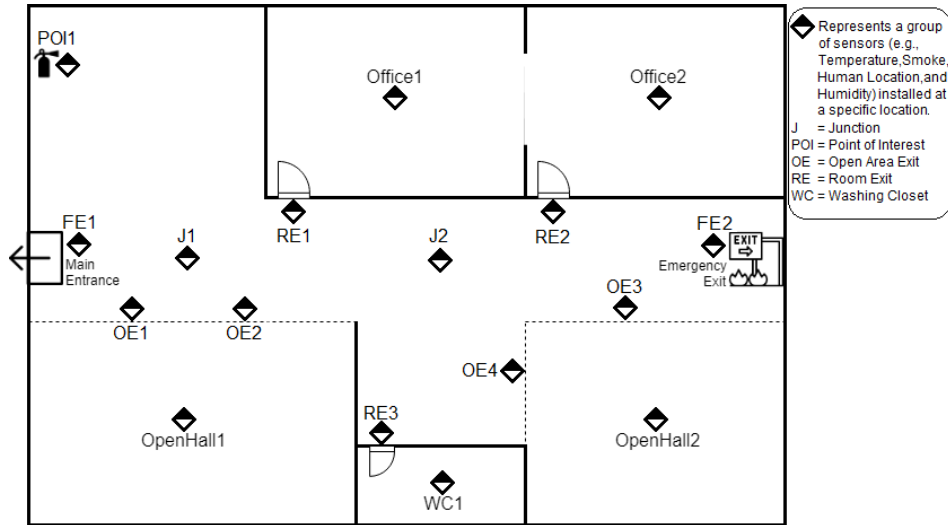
A building floor plan with an entrance (which may also be an exit), an emergency exit and some closed spaces
